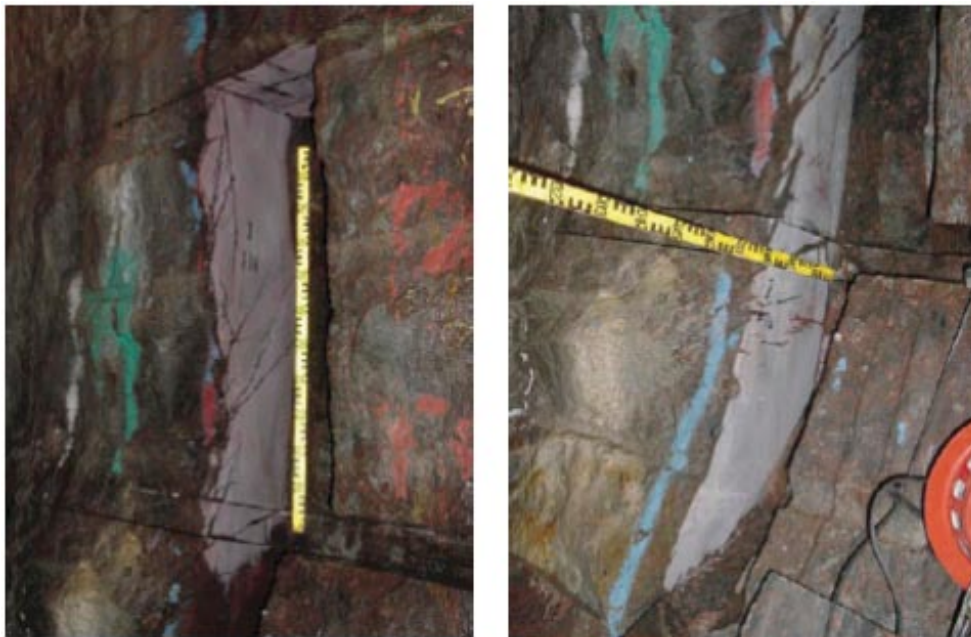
TASQ tunnel EDZ as observed in slot sawed in the left tunnel wall. Left: wall above bench. Right: bench.
